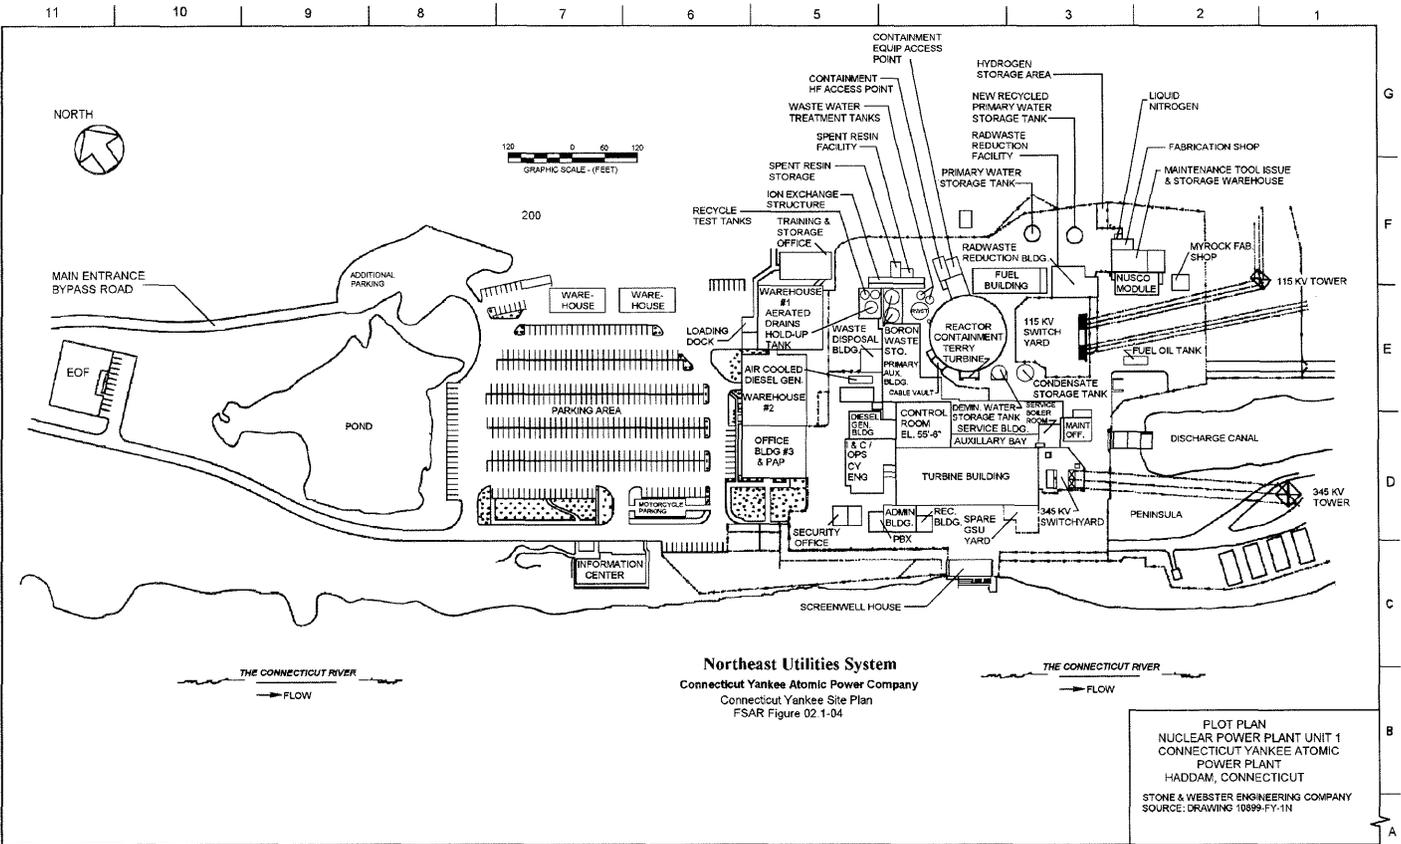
Site Plan - Haddam Neck Nuclear Power Plant
